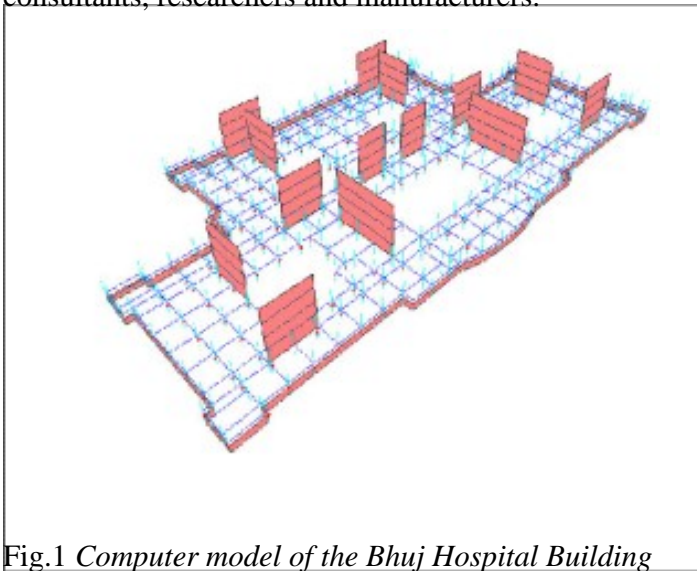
Computer model of the Bhuj Hospital Building with Floors removed so that bracing walls can be seen.
